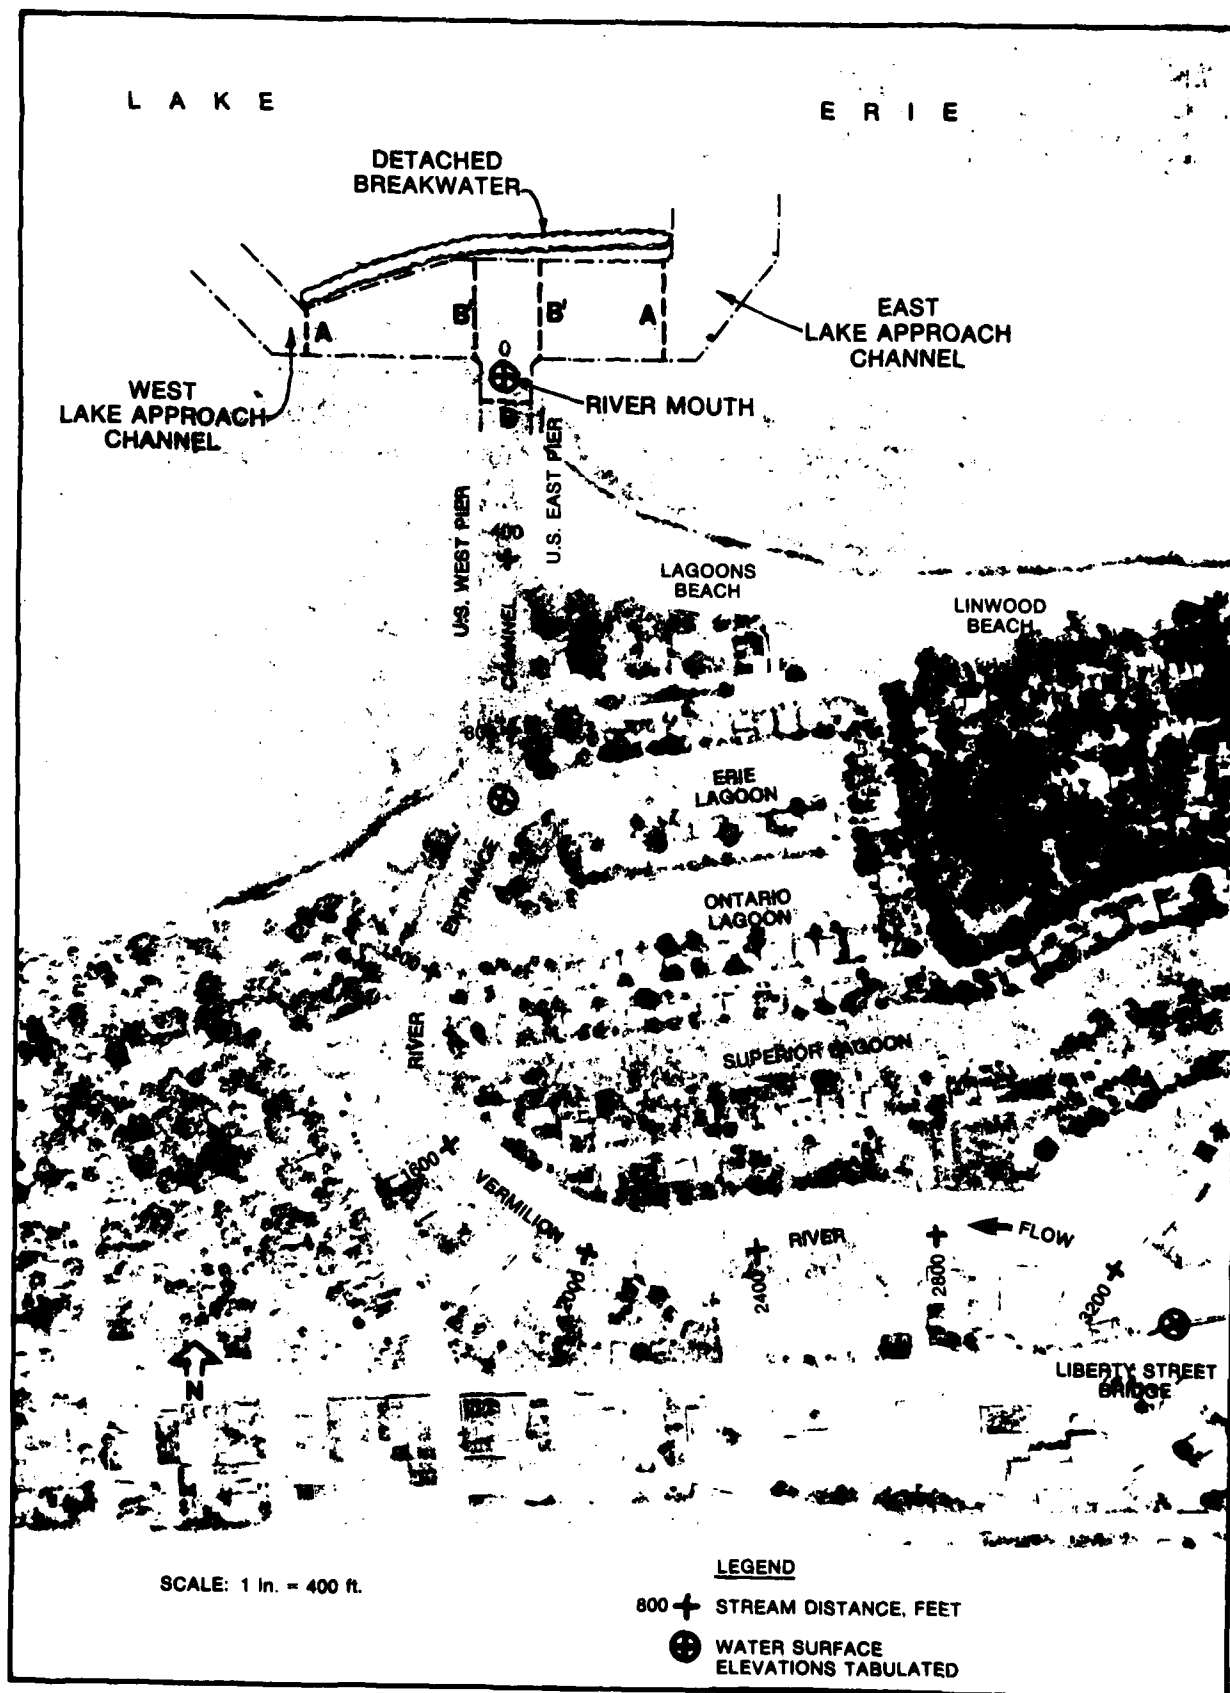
• PLAN VIEW OF BREAKWATER VICINITY
